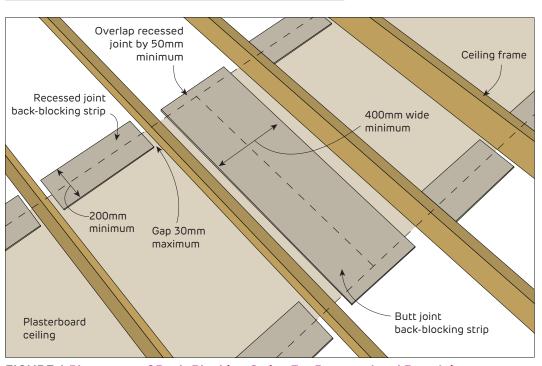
Placement of Back-Blocking Strips For Recessed and Butt Joints
